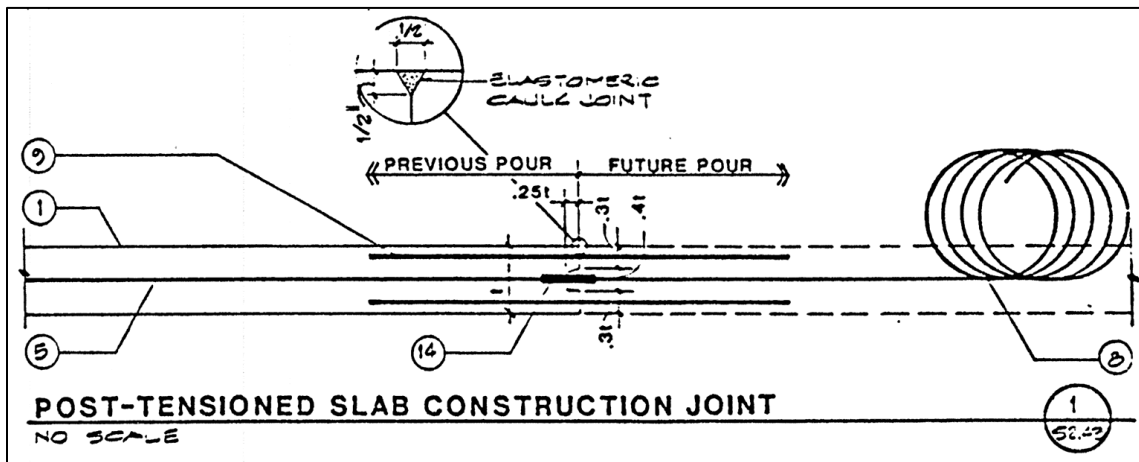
Schematic of the post-tensioning continuing through a construction joint in a slab, according to the as-built 1988 structural drawings.
